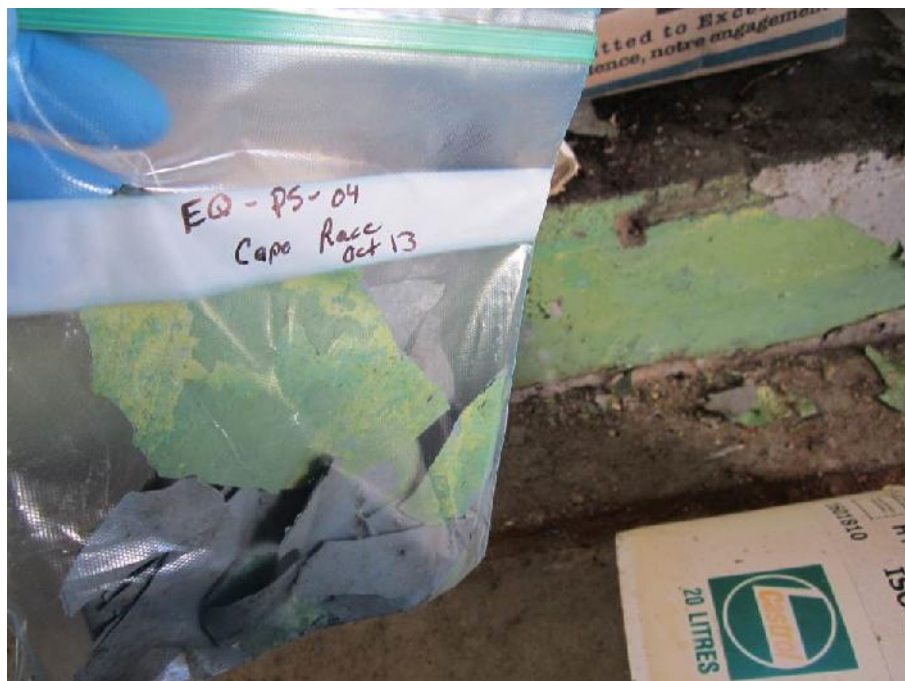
View of location of paint sample EQ-PS-4 (floor).
